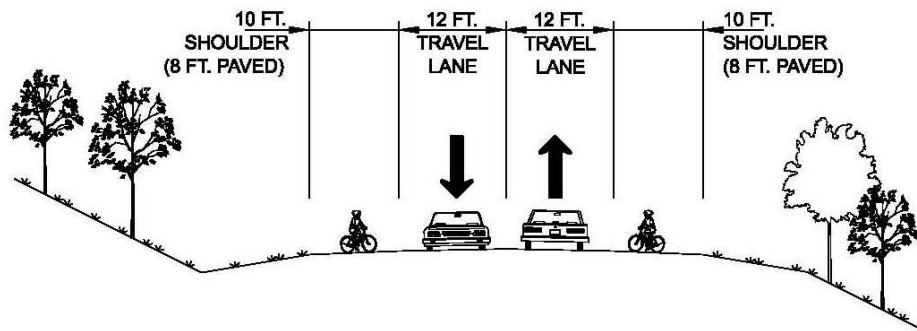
SEGMENT 5 PROPOSED TYPICAL SECTION
